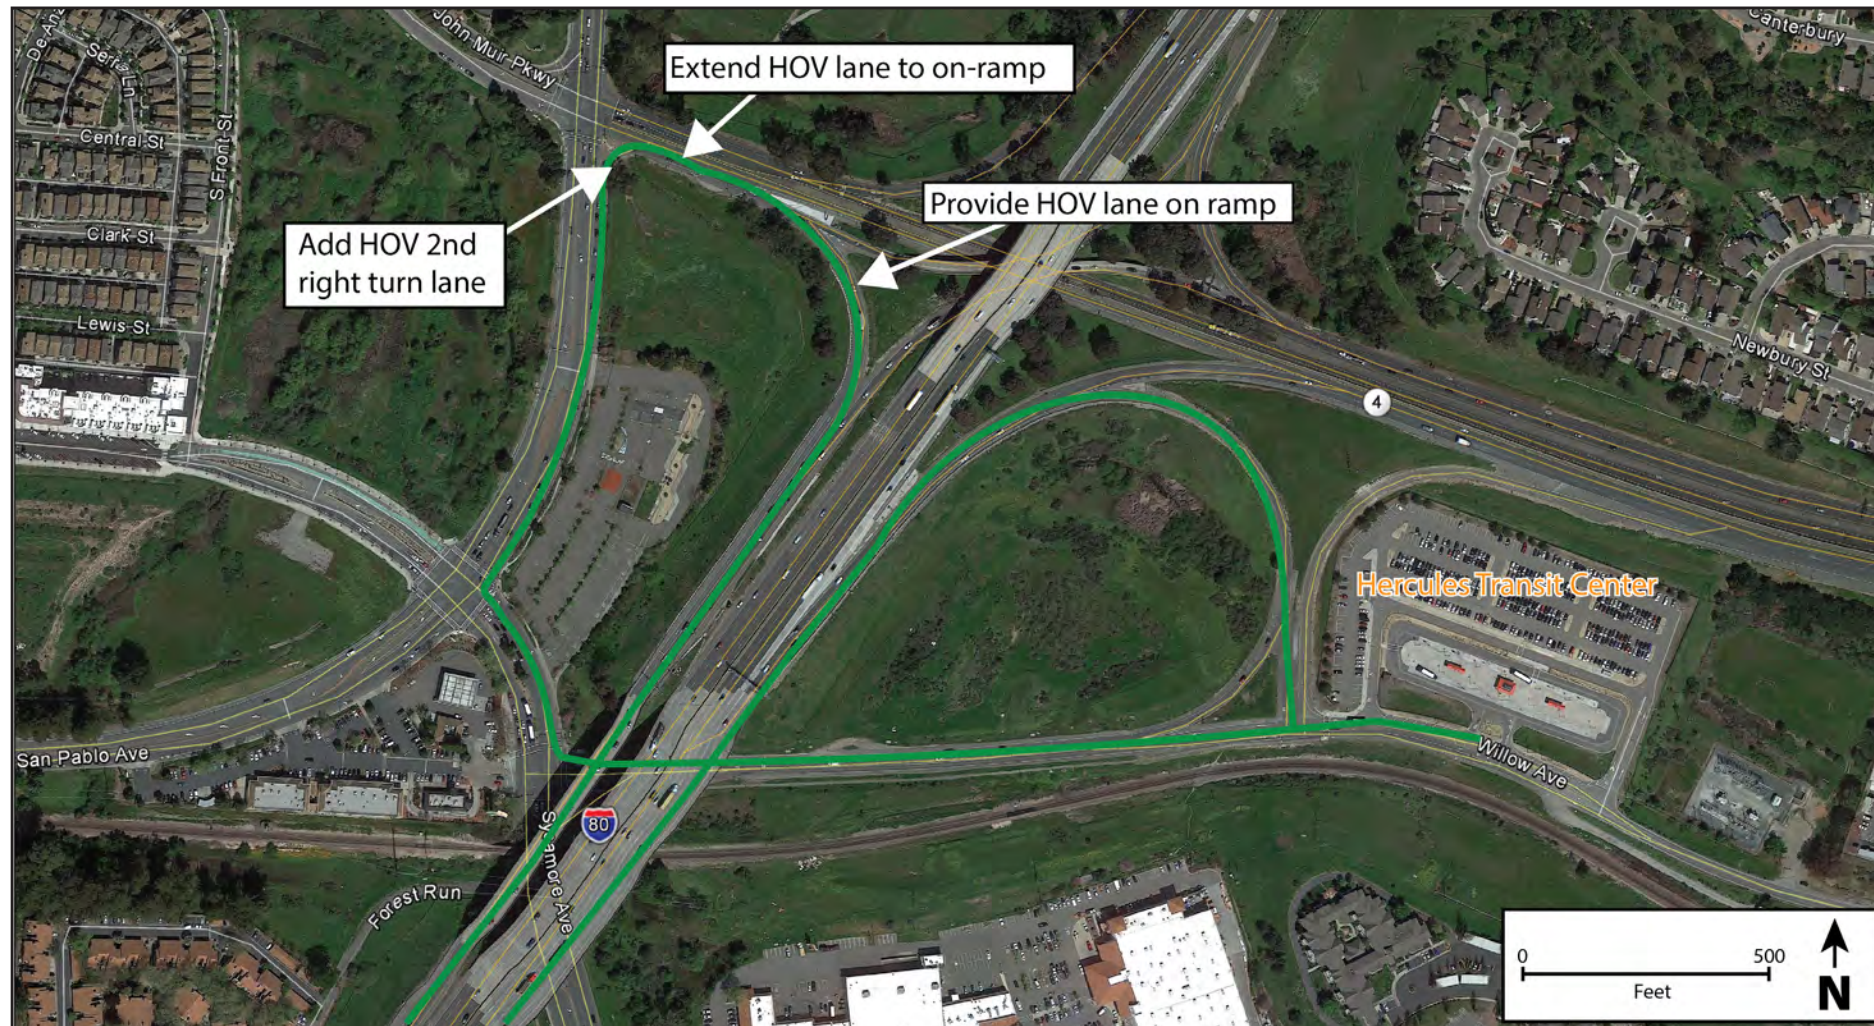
SR-4/John Muir Parkway/I-80 Access Improvements (FA1)
